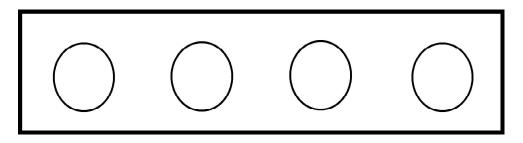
; Geopiers aligned at 48" c-c within 3 feet wide strip footing
